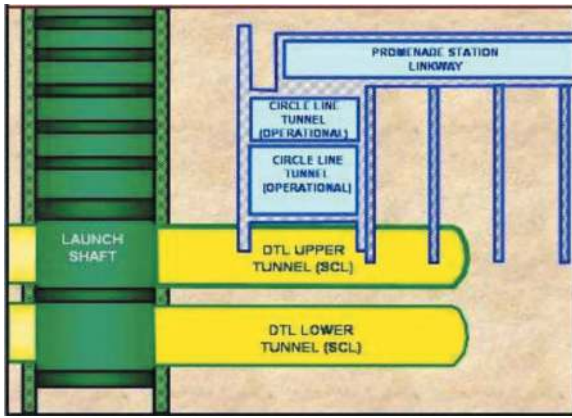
Longitudinal profile of tunnels undercrossing live MRT.
